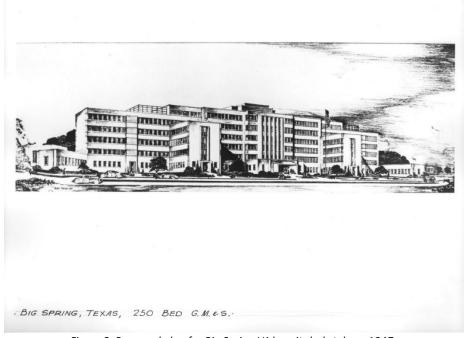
Proposed plan for Big Spring VA hospital; sketch ca. 1947.
